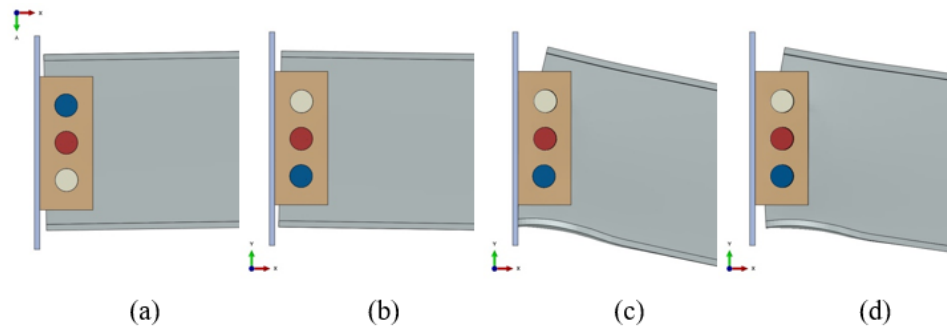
The Stages of Fin Plate Connection Model under the Loading and Fire Condition.
